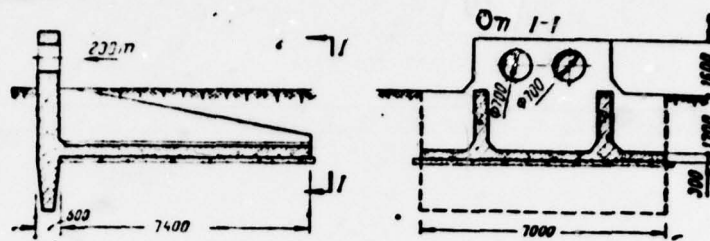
Fixed support from monolithic reinforced concrete with low pipe laying.
